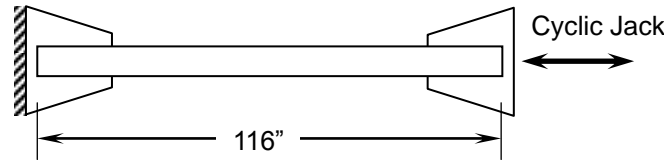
Geometry of tests specimens in NEES fracture project tube braces
